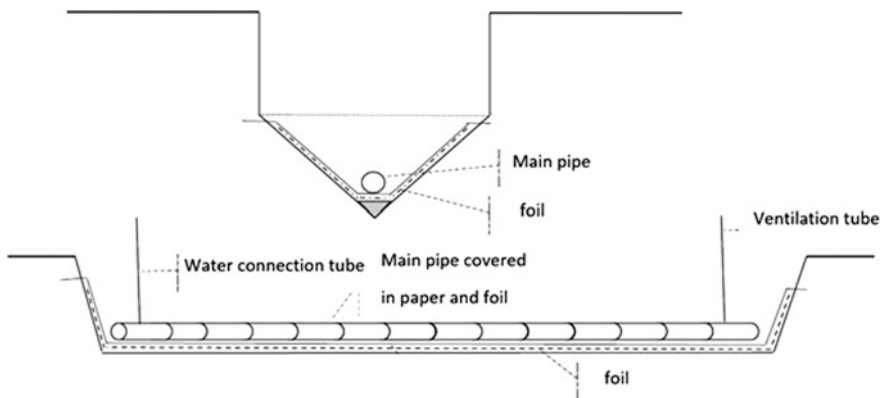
Technical overview of GRP drainage construction. *Source* Adapted from Korrman (2014)
